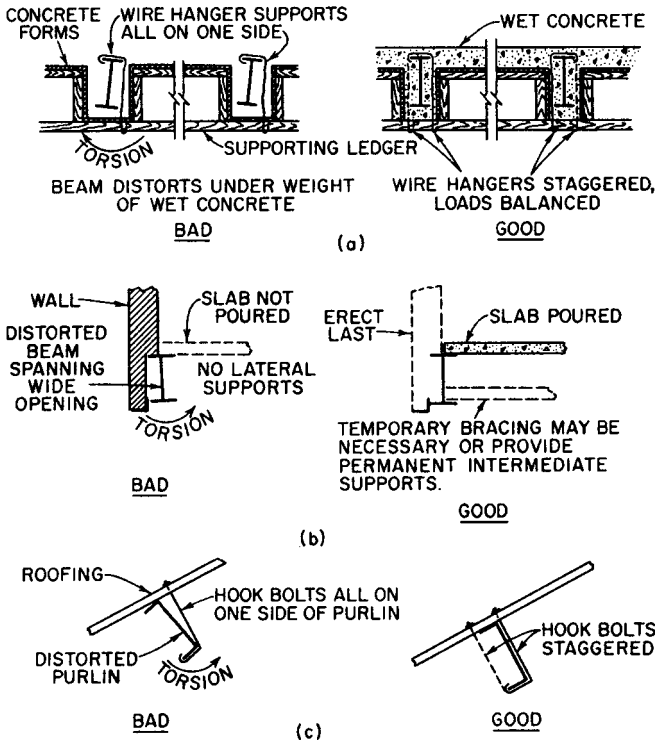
Steel beams subject to torsion—good and bad practice.
